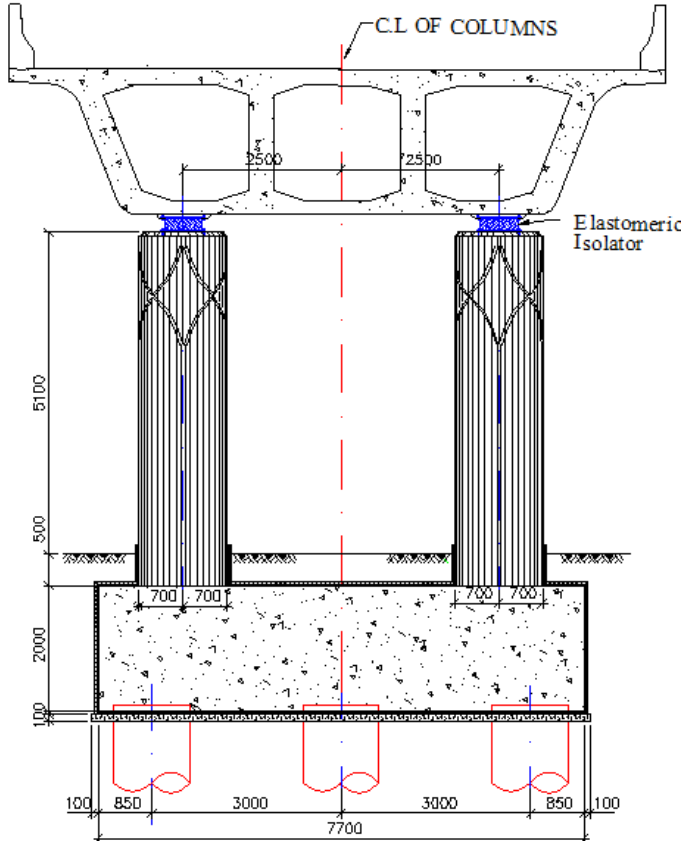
RC Bridge. Geometry of the Pylons (dimensions in mm).
